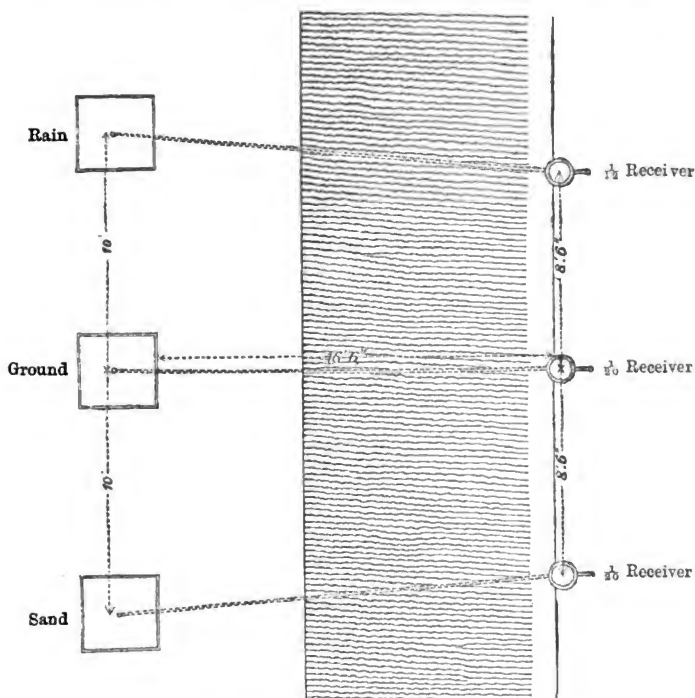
General Plan of the Dalton Gauges, Lee Bridge.
